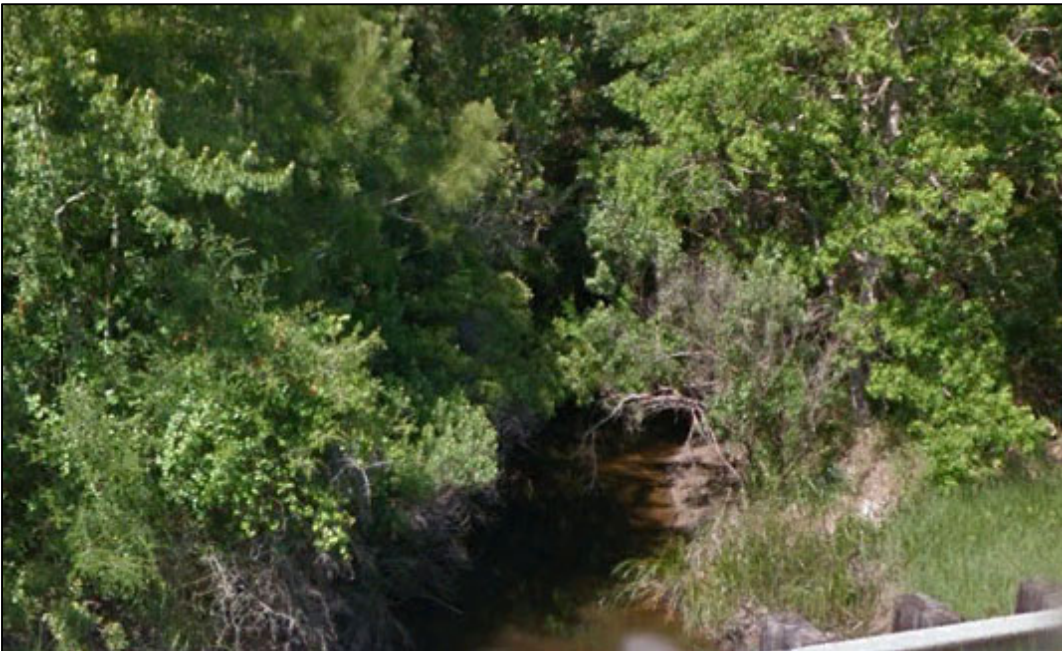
Channel culvert crossing of upper Bayou Como at Highway 188
